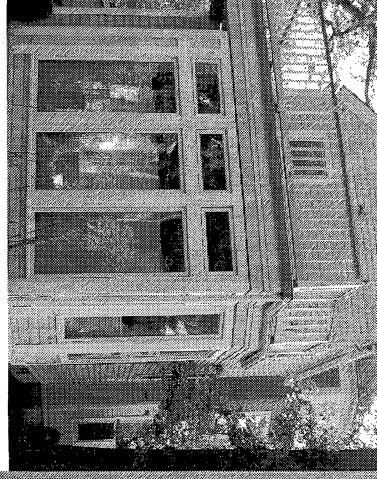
EXISTING OF PROPOSED STAIR LOCATION FROM WALKWAY
